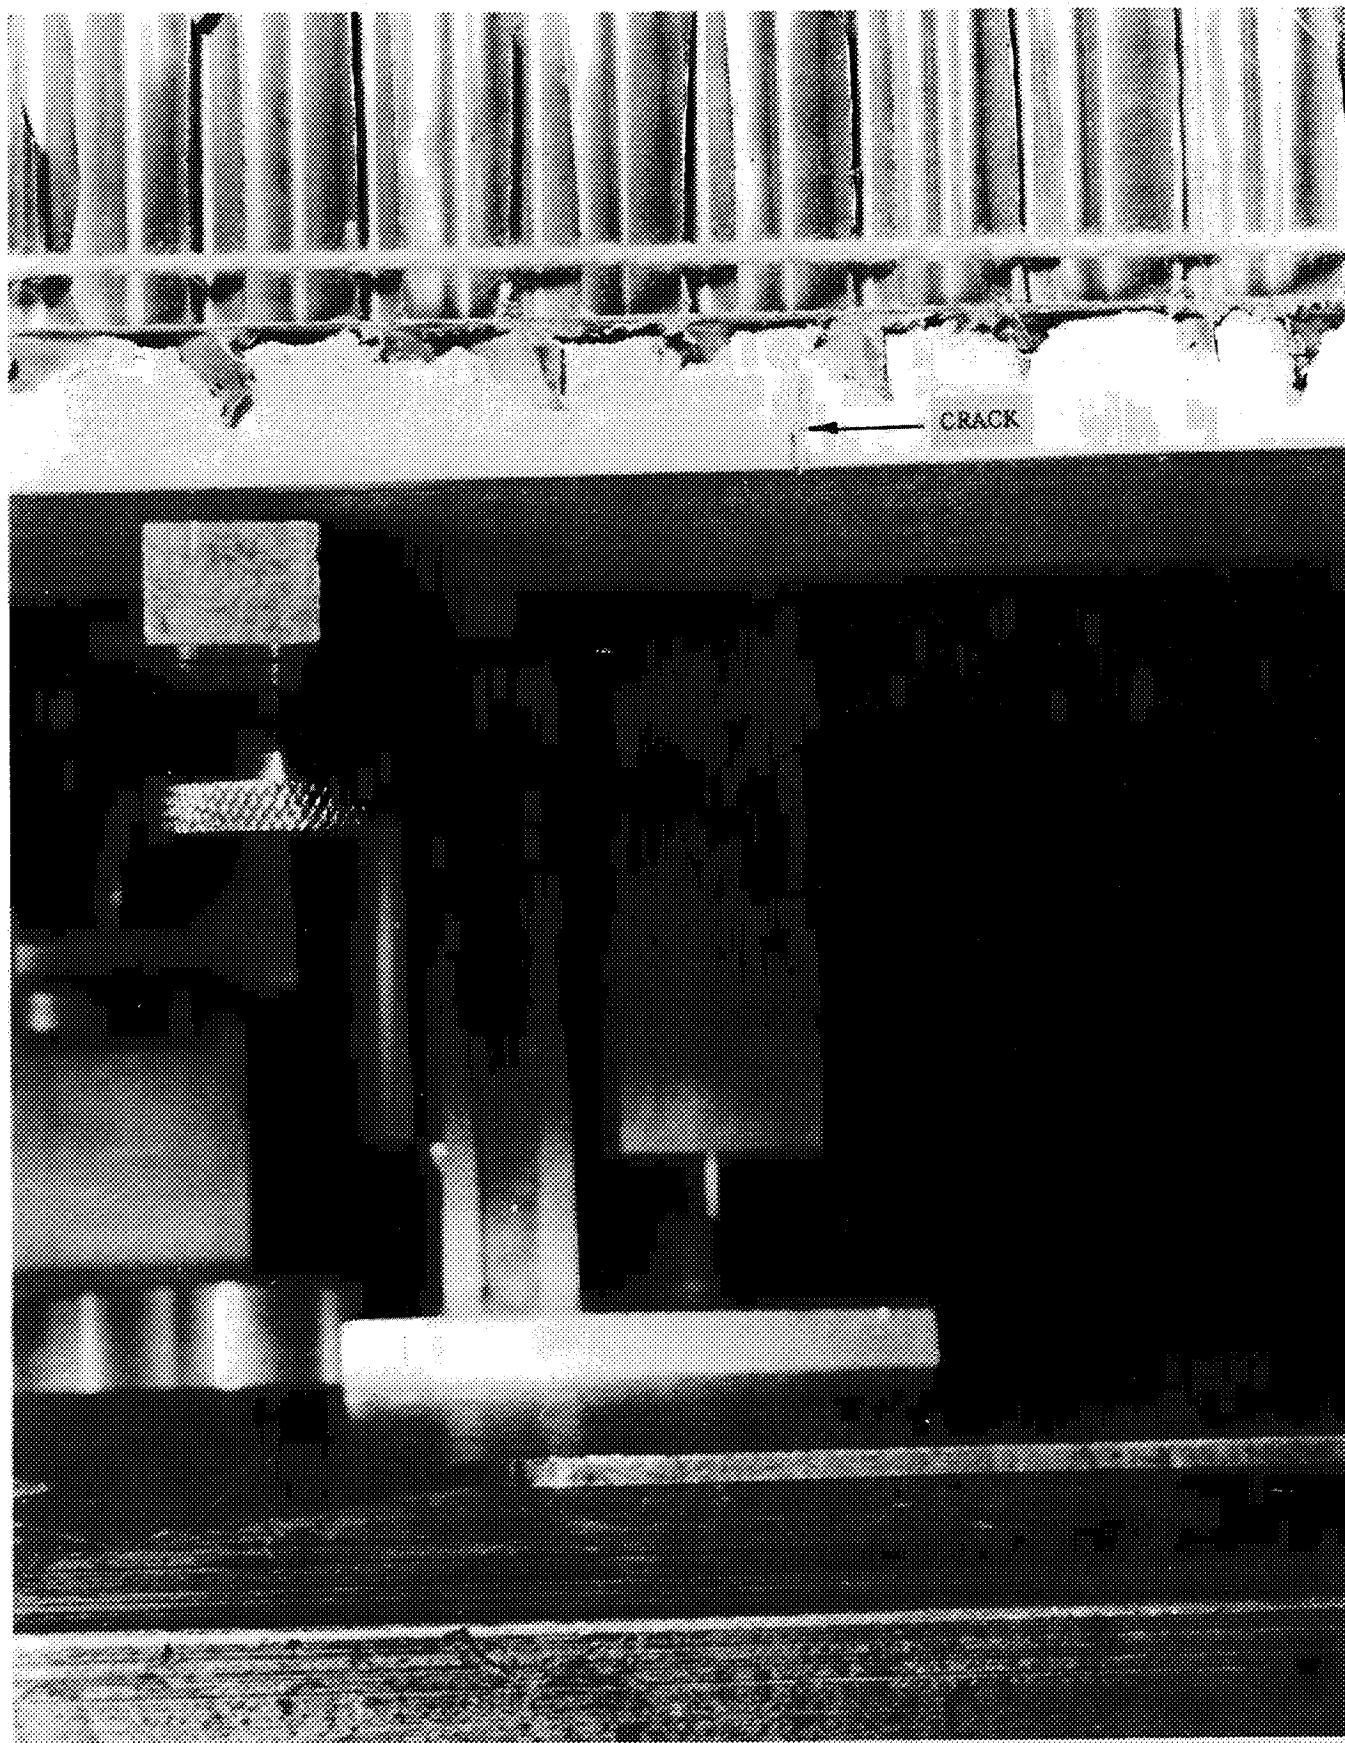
Flexure Test of Sandwich Section with M-31 Insulation at Failure
